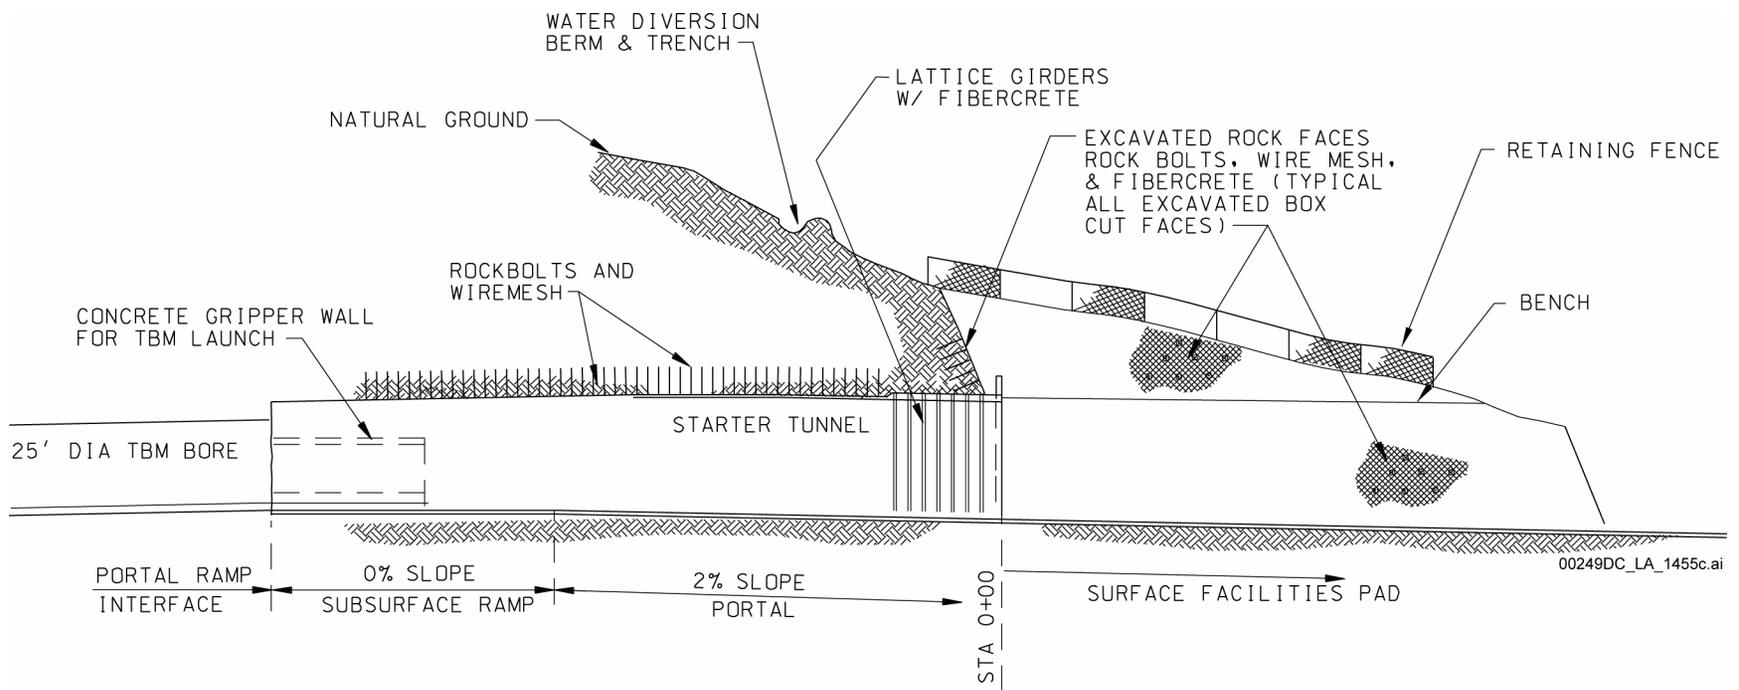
North Construction Portal Long Section with Construction Features
